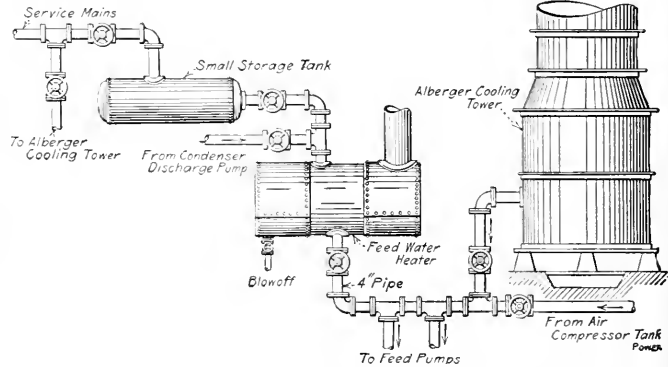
OLD BOILER USED AS A FEED-WATER HEATER
